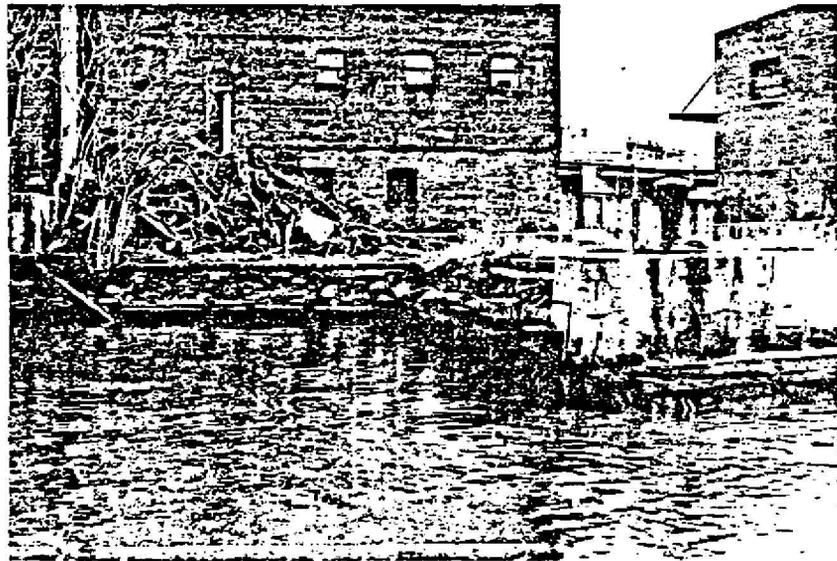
Nineteenth century bulkhead construction exposed by erosion.
